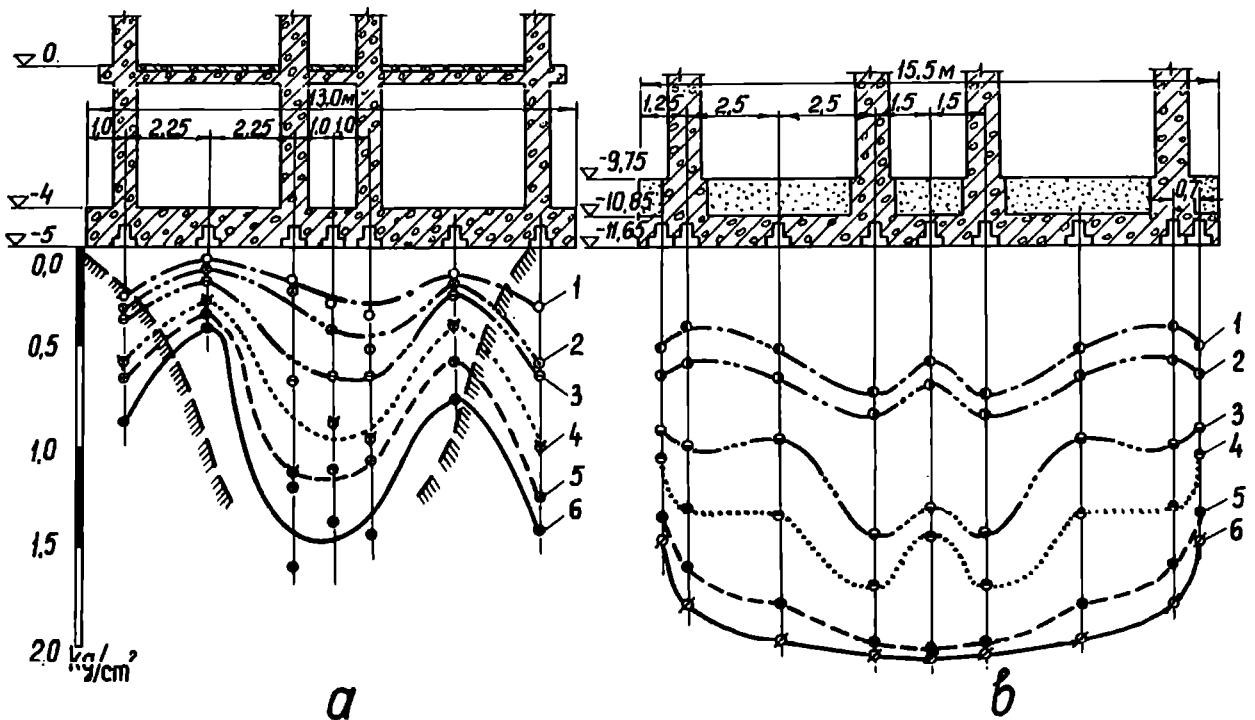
Fig. I. Schematic cross-sections of the slab-foundations of two buildings: building "a" - erected on the site of what was once a ravine which was subsequently filled up; building "b" - erected on a basement of undisturbed structure soil.
